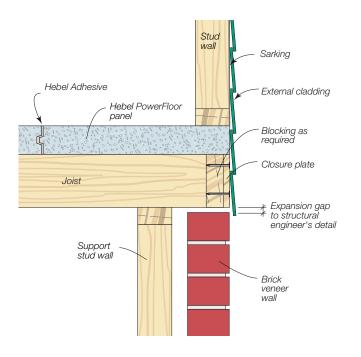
Constructed Detail at Cantilevered Joist
